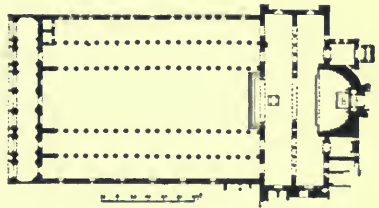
PLAN OF THE BASILICA OF ST. PAUL.
